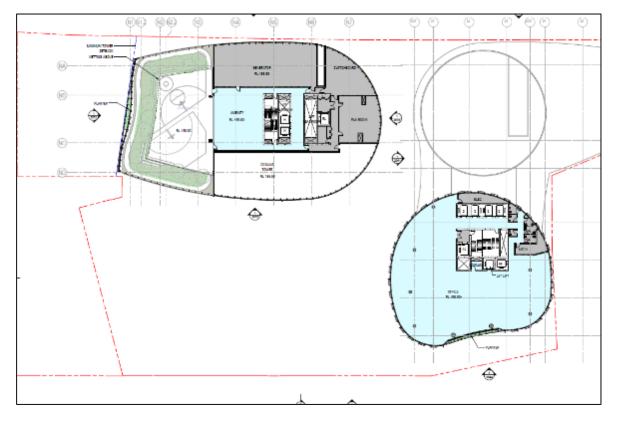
Level 36 Floor Plan - Typical Levels 34-37 High Rise Plan for South Tower and Roof Plan of North Tower
